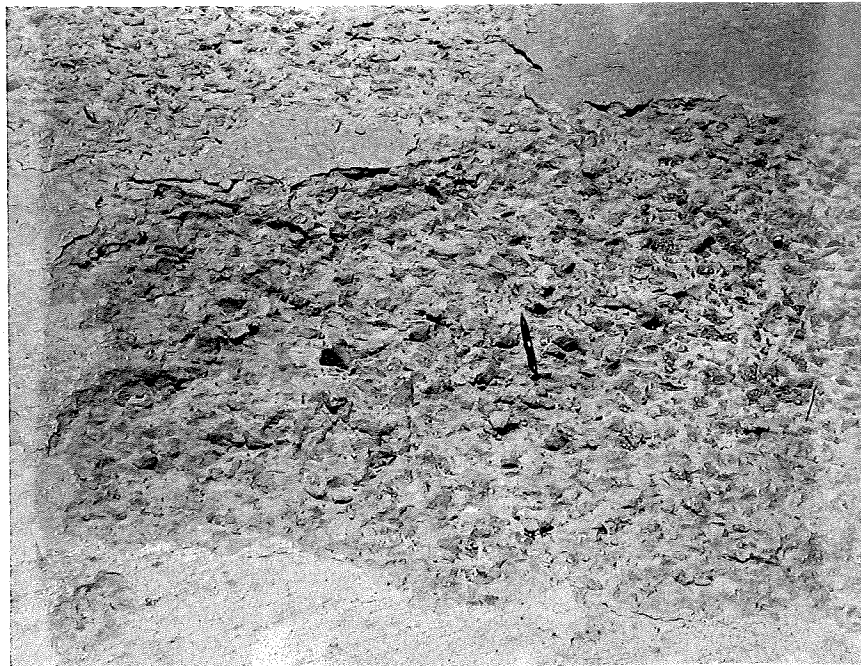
Close view showing depth of spalling. 34+00.
